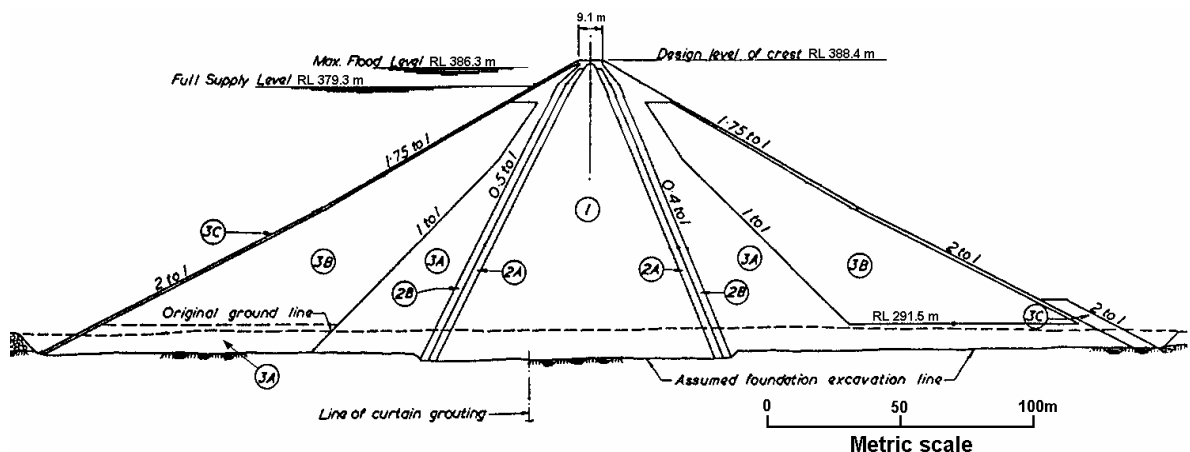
Main section at Blowering dam (courtesy of NSW Department of Public Works and Services, Dams and Civil Section).
